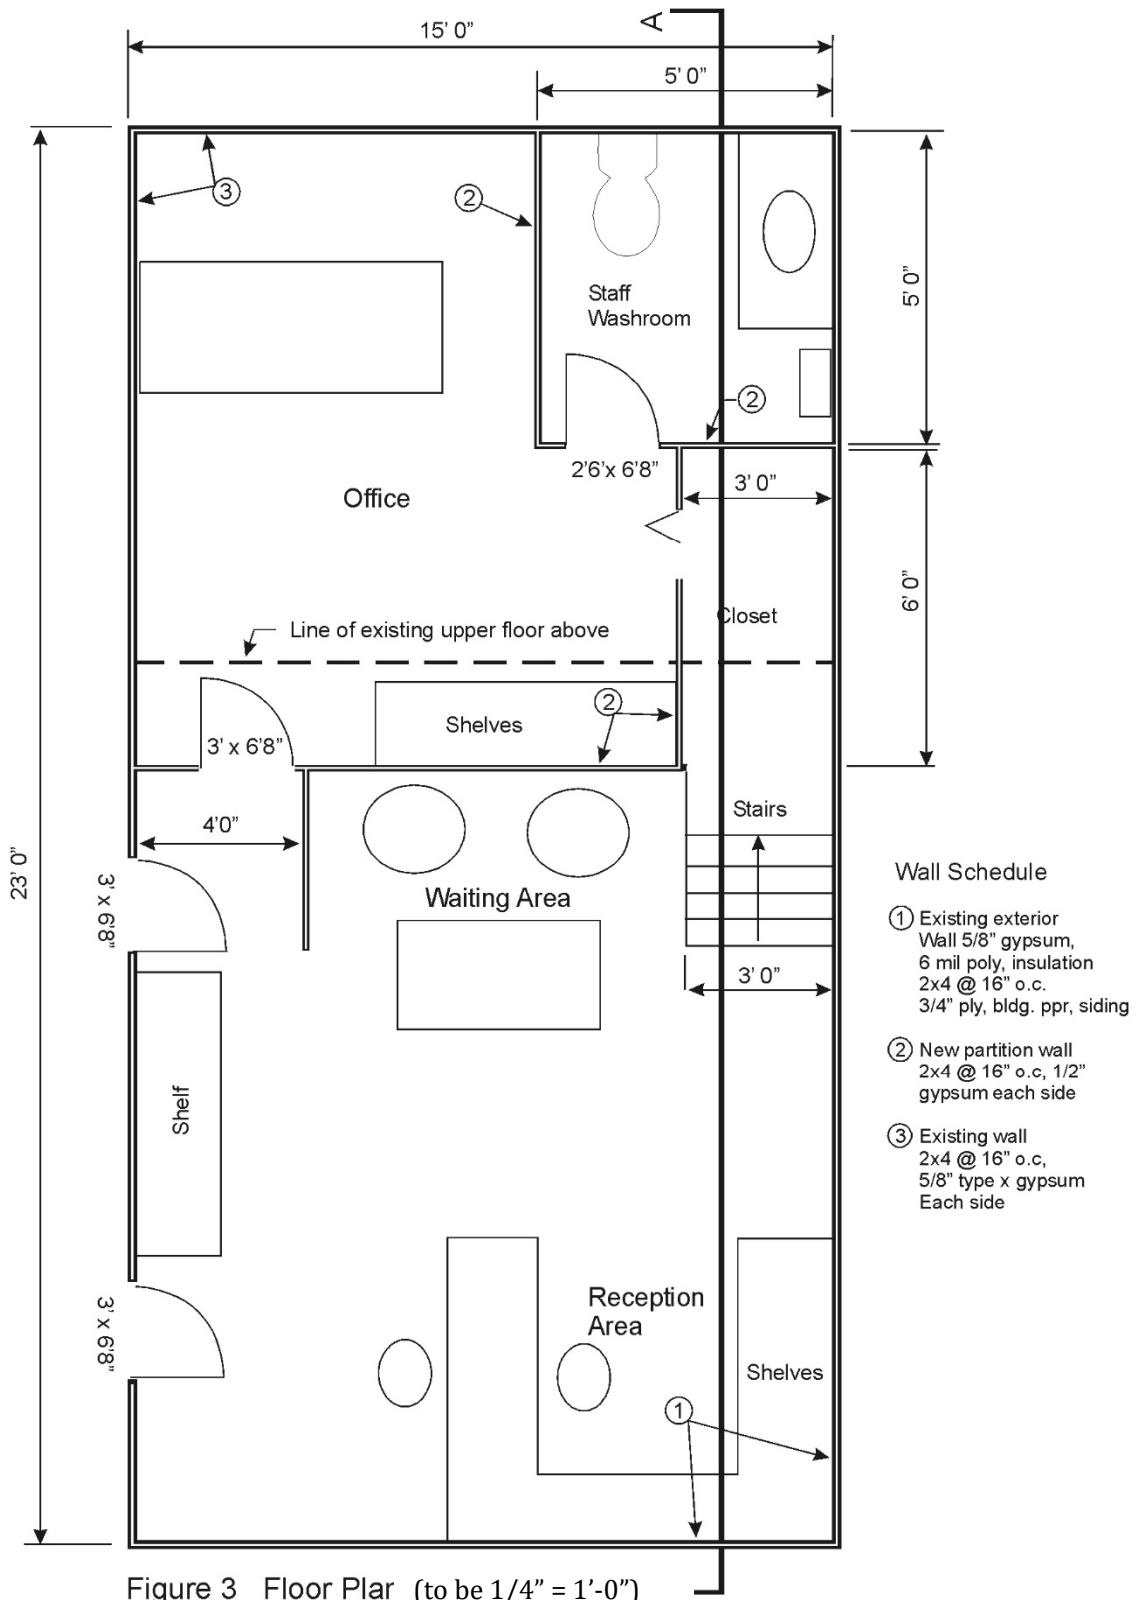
Floor Plan (to be 1/4" = 1'-0")
